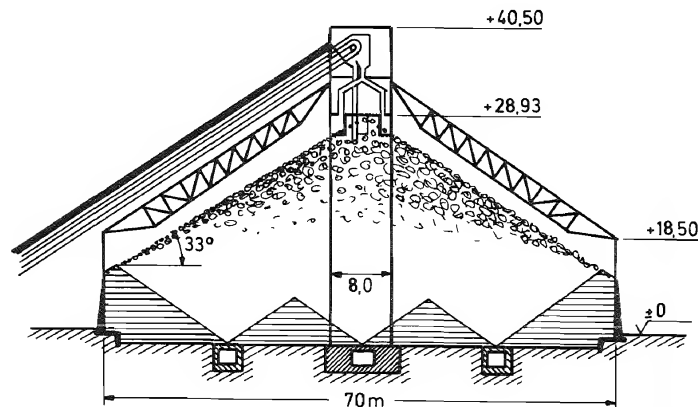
Cross-section through a tent-shaped clinker store (from Sillem, 1972)
